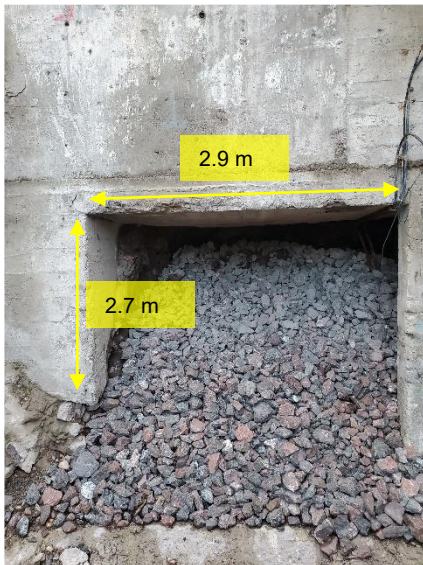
Close-up of Raise 1 that was backfilled with -5 to -8 inch material.
